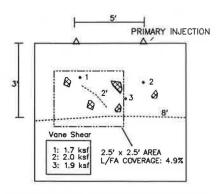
L/FA distribution on front wall of test pit at Station 100+15.
